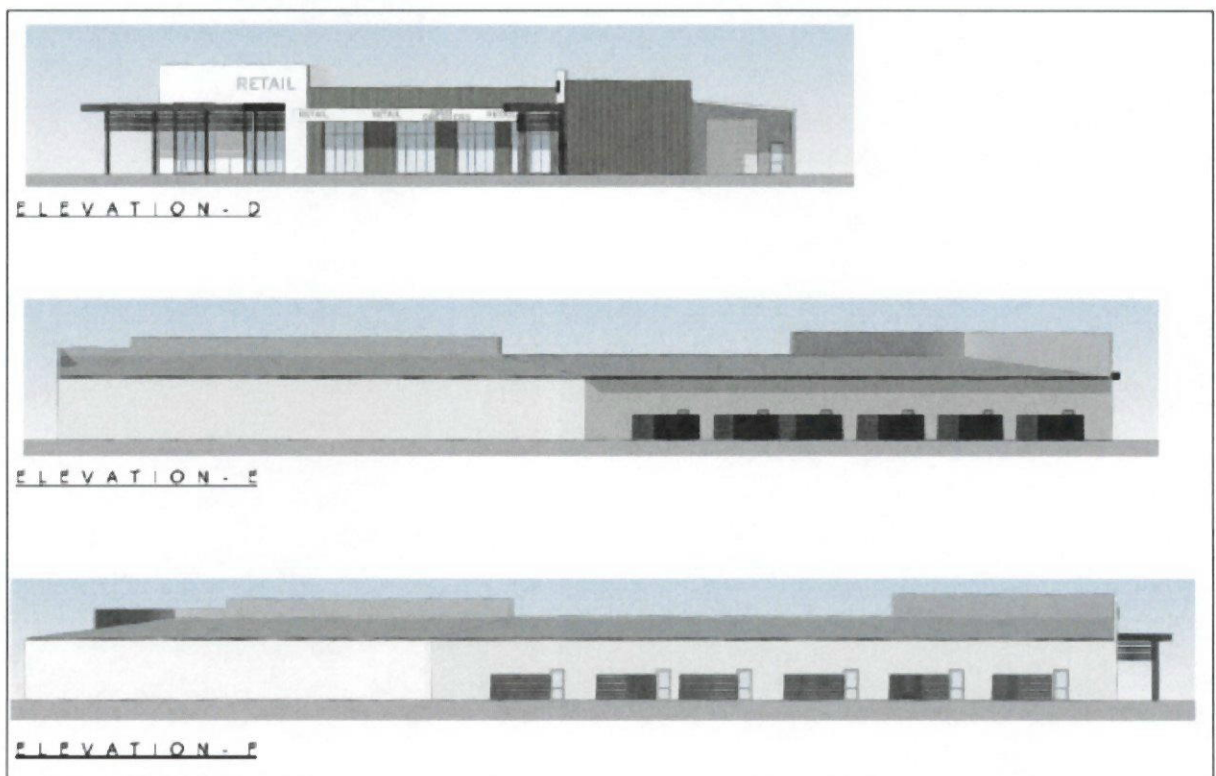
Proposed elevations D – F; being the northern, western and southern elevation.
